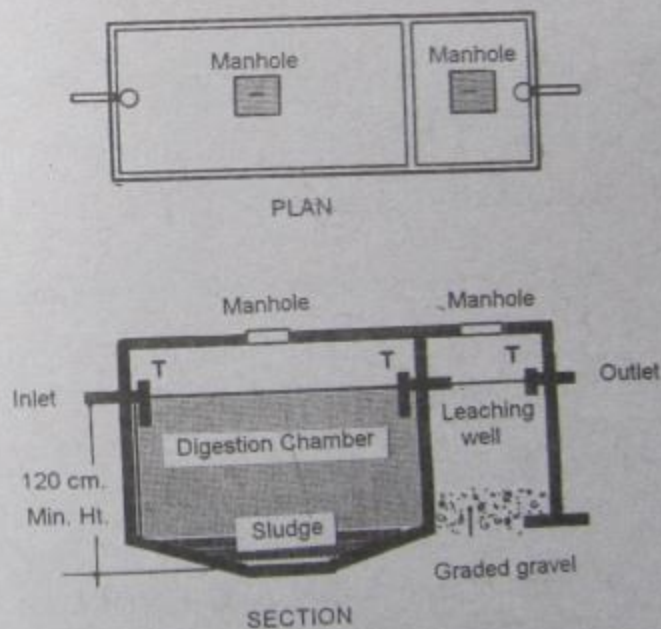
PLAN AND SECTION OF SEPTIC TANK
